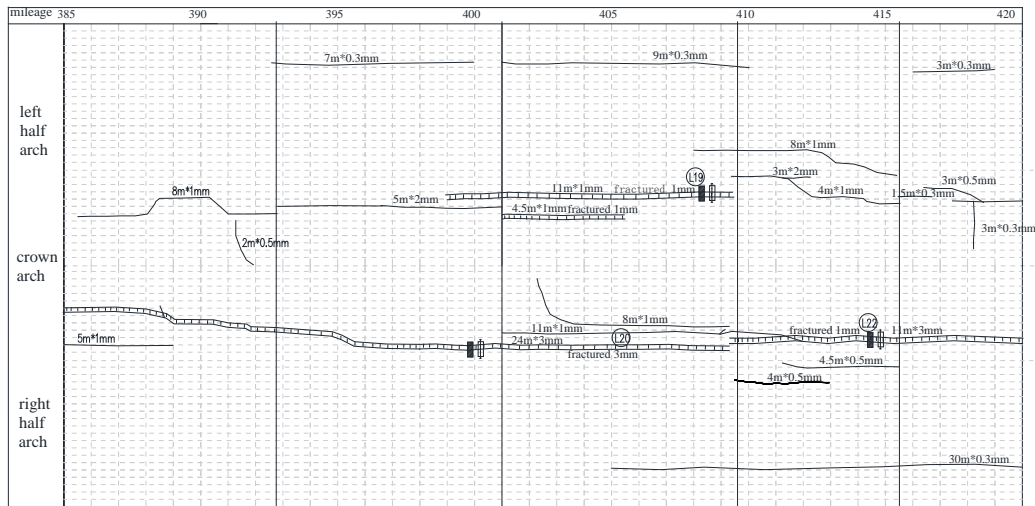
The distribution of imperfections and damages on tunnel lining at DIK68+385-420 (cracks are majorly longitudinal found at the intrados of tunnel arch shoulder)
